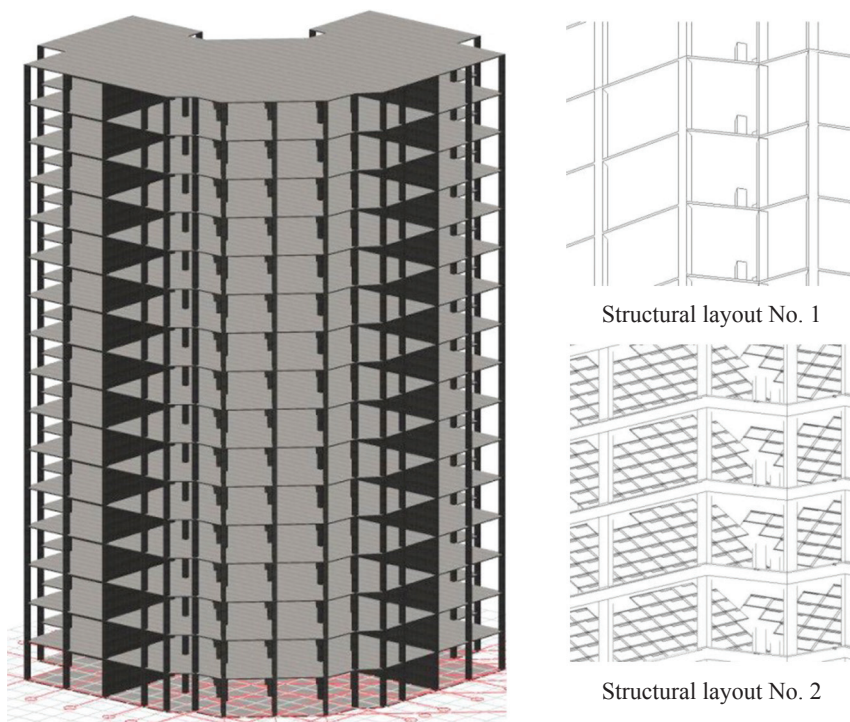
Structural layouts of monolithic reinforced concrete frame
